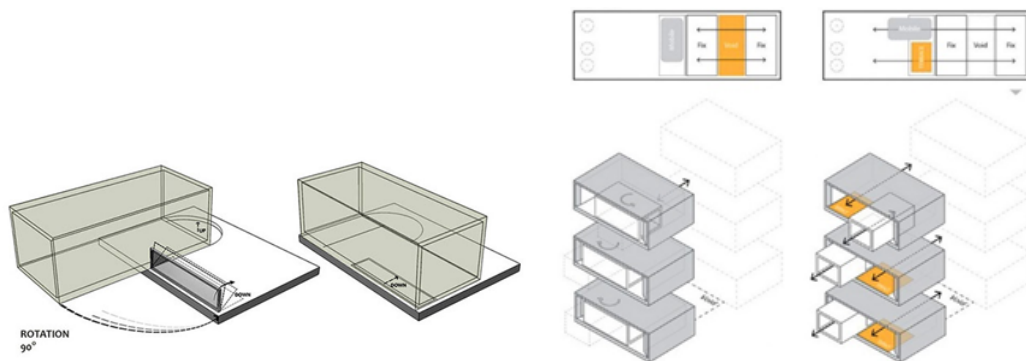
Rotating Mechanism and Structural Layout (ArchDaily, 2014).
